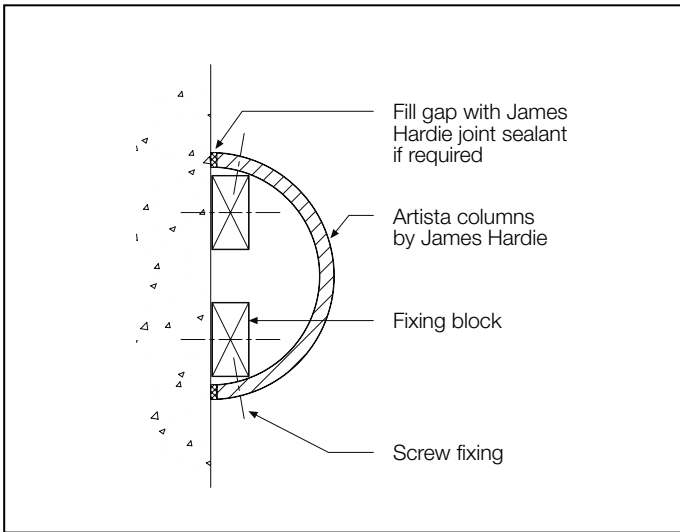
DECORATIVE HALF COLUMN TO WALL DETAIL
